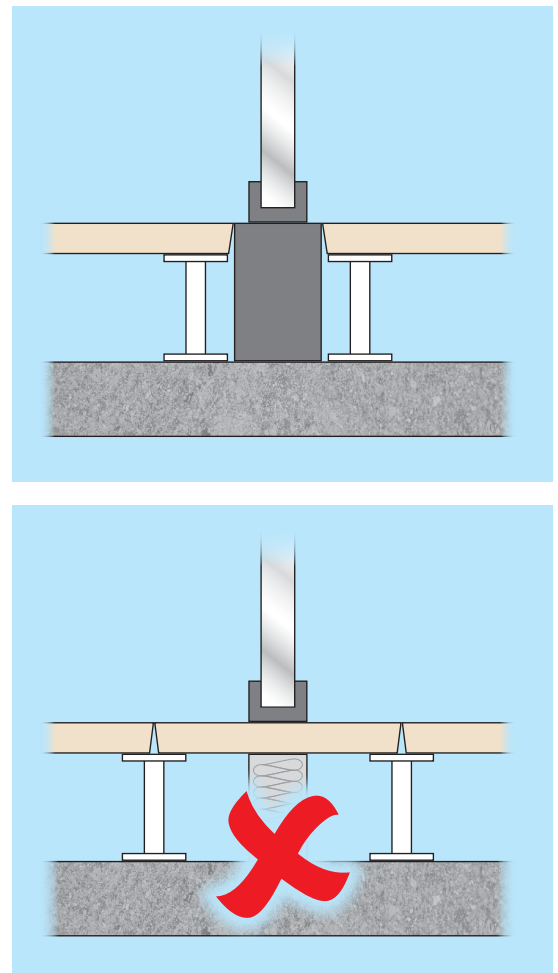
Limitations - nature and extent of the tested supporting construction. A supporting construction that conforms to the definitions in EN 1363-1, and is proven by fire test, should be used with raised access floor broken either side. Unless supported by relevant fire test evidence, a raised access floor with a fire stop beneath does not satisfy that requirement.
